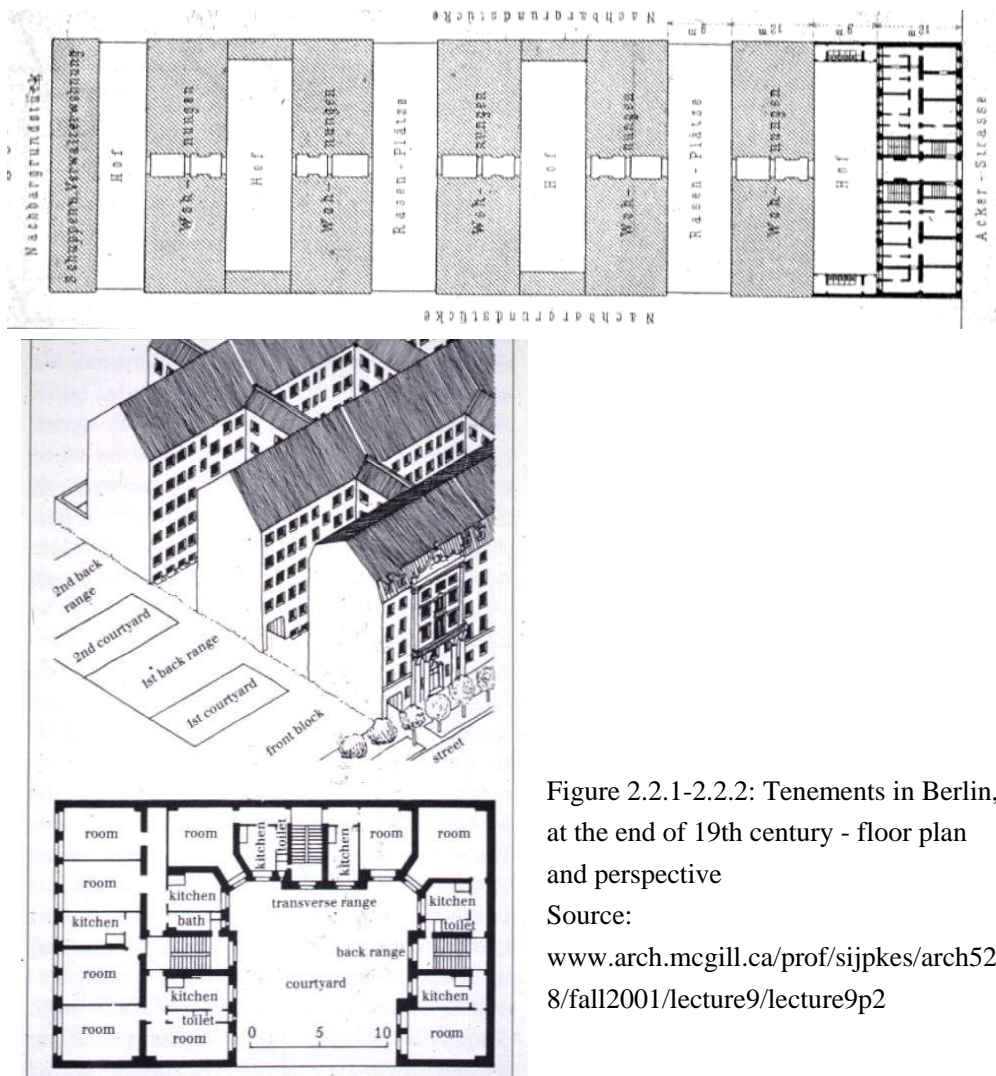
Tenements in Berlin, at the end of 19th century - floor plan and perspective
